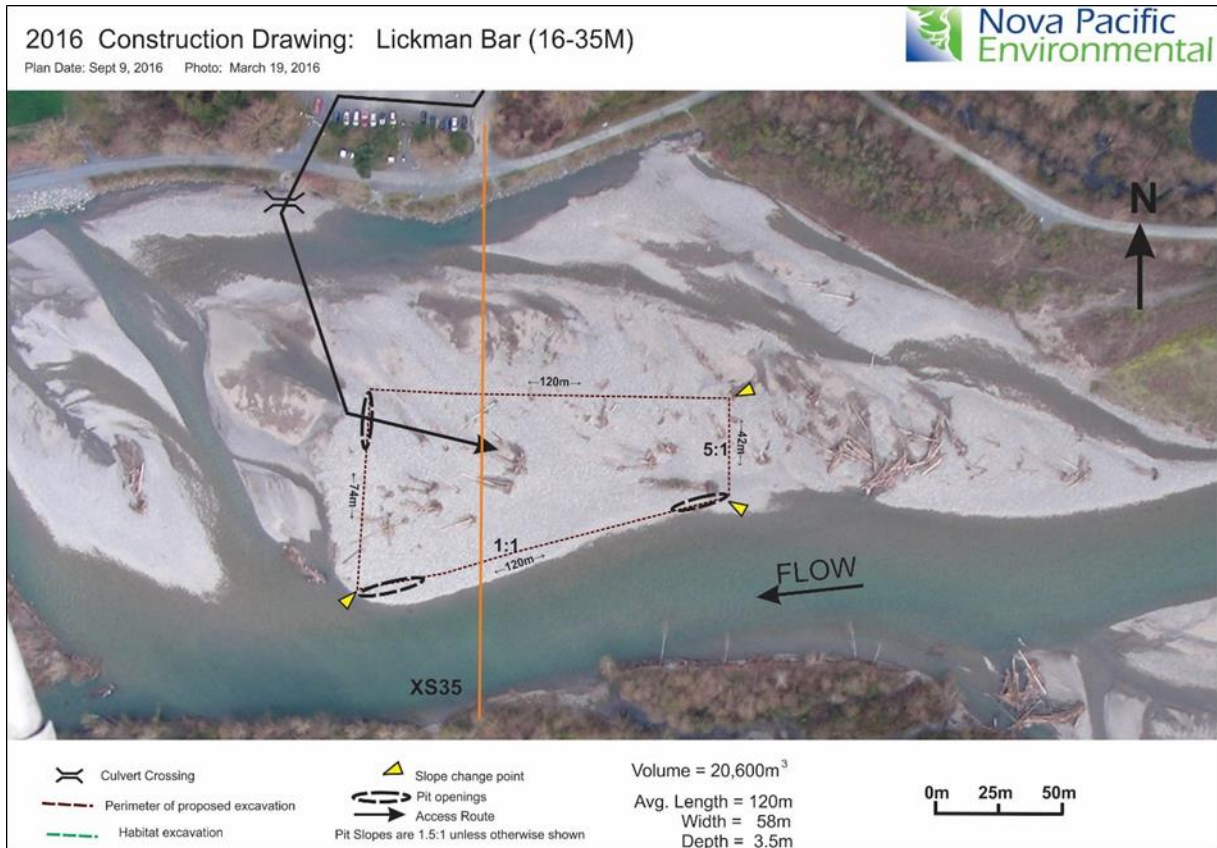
Aerial view of the Lickman Bar excavation plan. Photo taken March 19, 2016, drawing – September 9, 2016.
